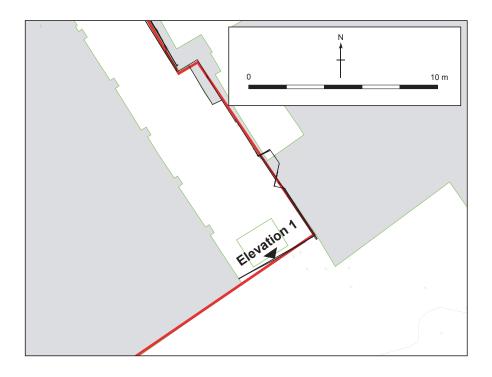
Kalendar Hall, Cathedral School, Exeter: Elevation 1
